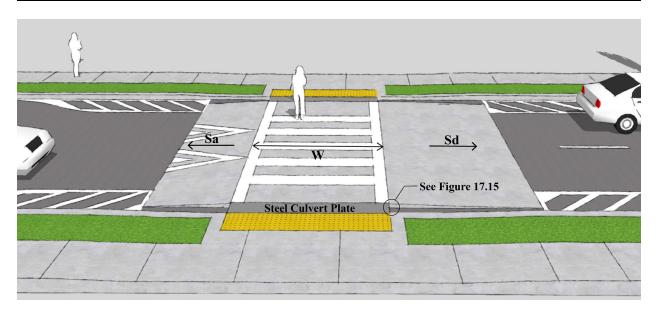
RAISED CROSSWALK ON A ONE-WAY ROADWAY WITH THE APPROACH SLOPE (Sa), DEPARTURE SLOPE (Sd) AND PLATFORM WIDTH (W)
